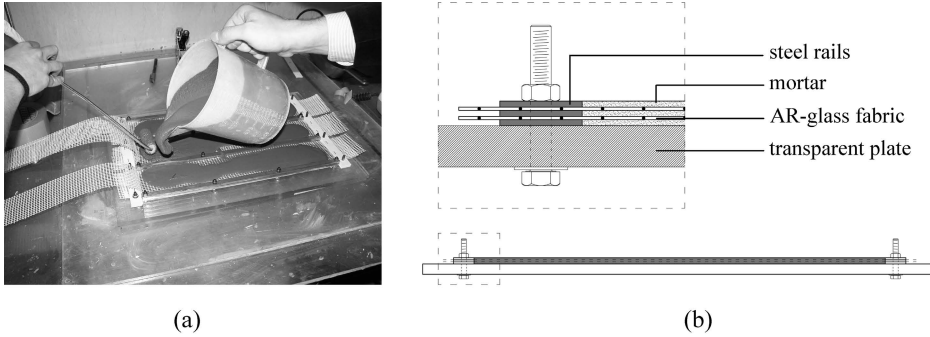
Specimen preparation (a) and section of the specimen in the formwork (b).
